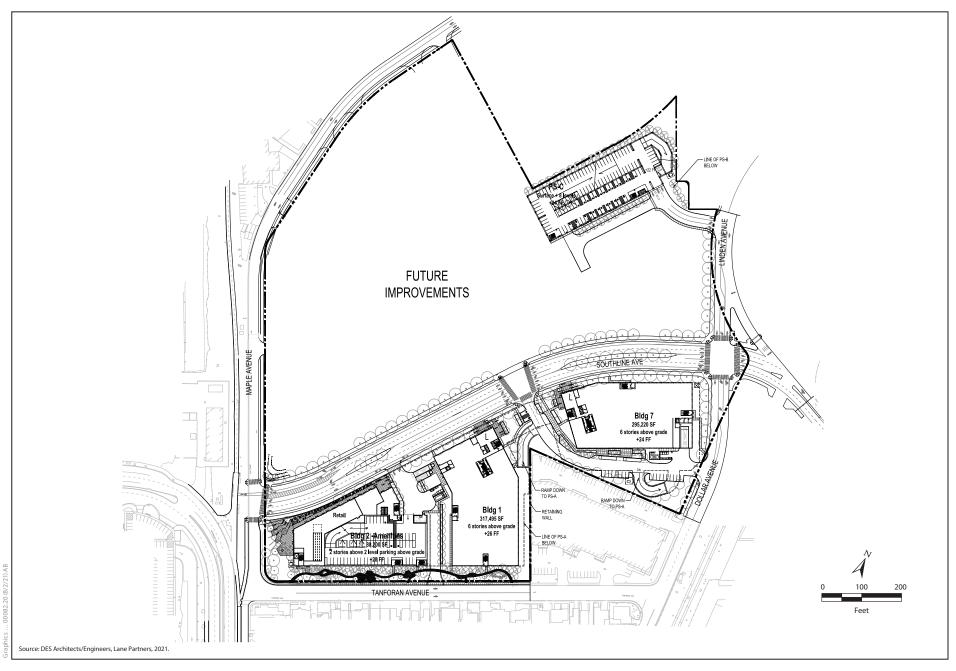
No Intersection Alternative—Phase 1 Conceptual Site Plan
